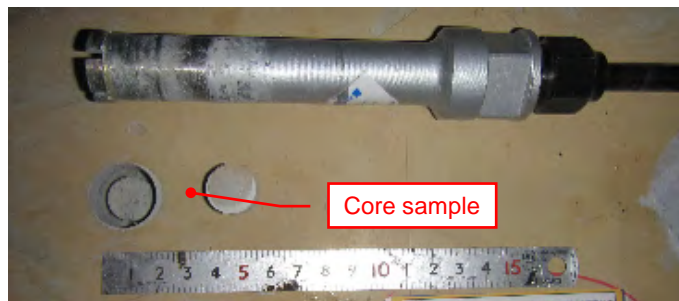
Drilling tool manufactured considering remote operation and the collected painted concrete floor sample
